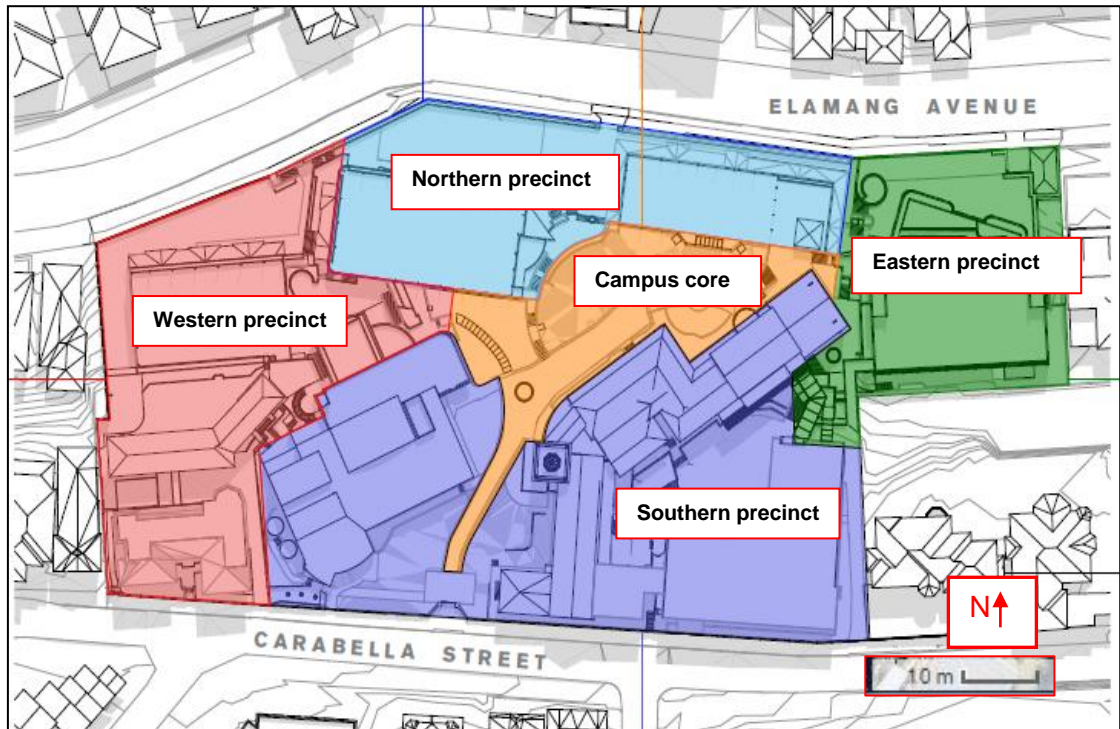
Proposed Precinct Plan (Source: Applicant's EIS)
